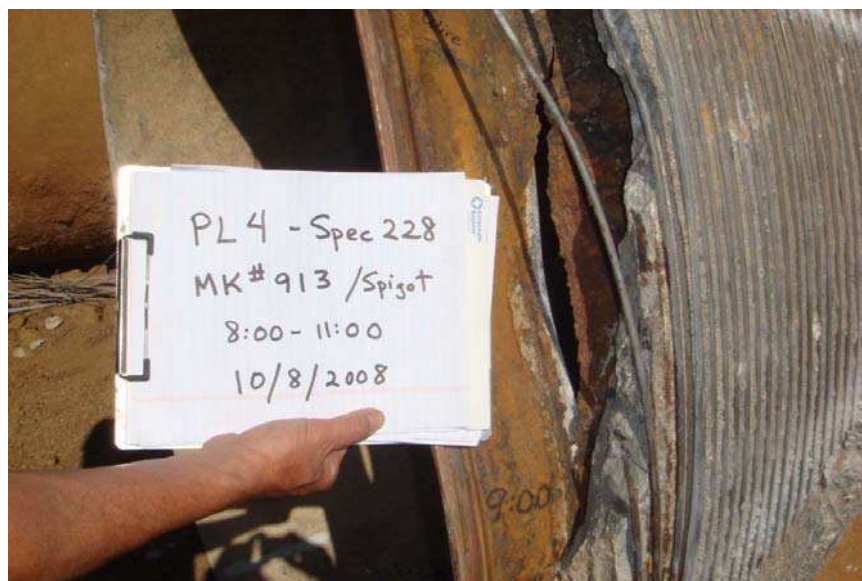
Joint Ring Corrosion and Cylinder Separation
